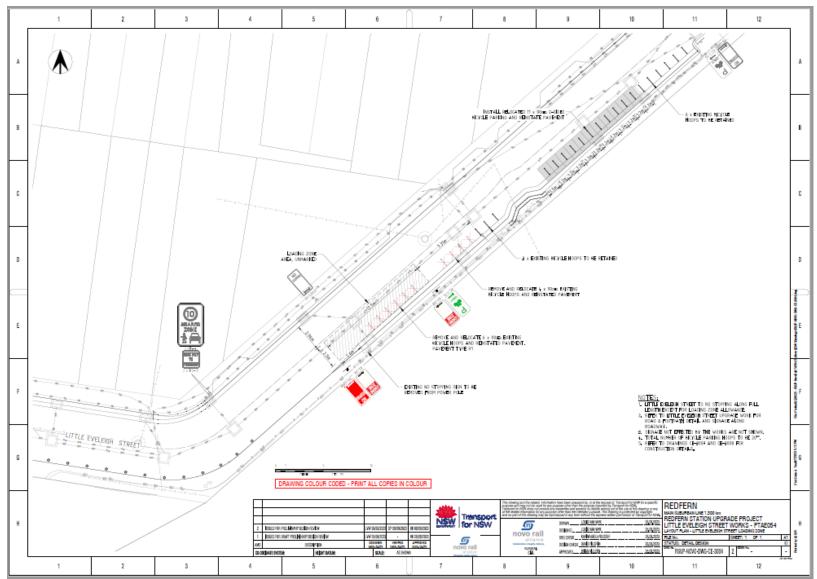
Redfern Station Upgrade Project Little Eveleigh Street Works - Ptae054 - Layout Plan - Little Eveleigh Street Loading Zone.
